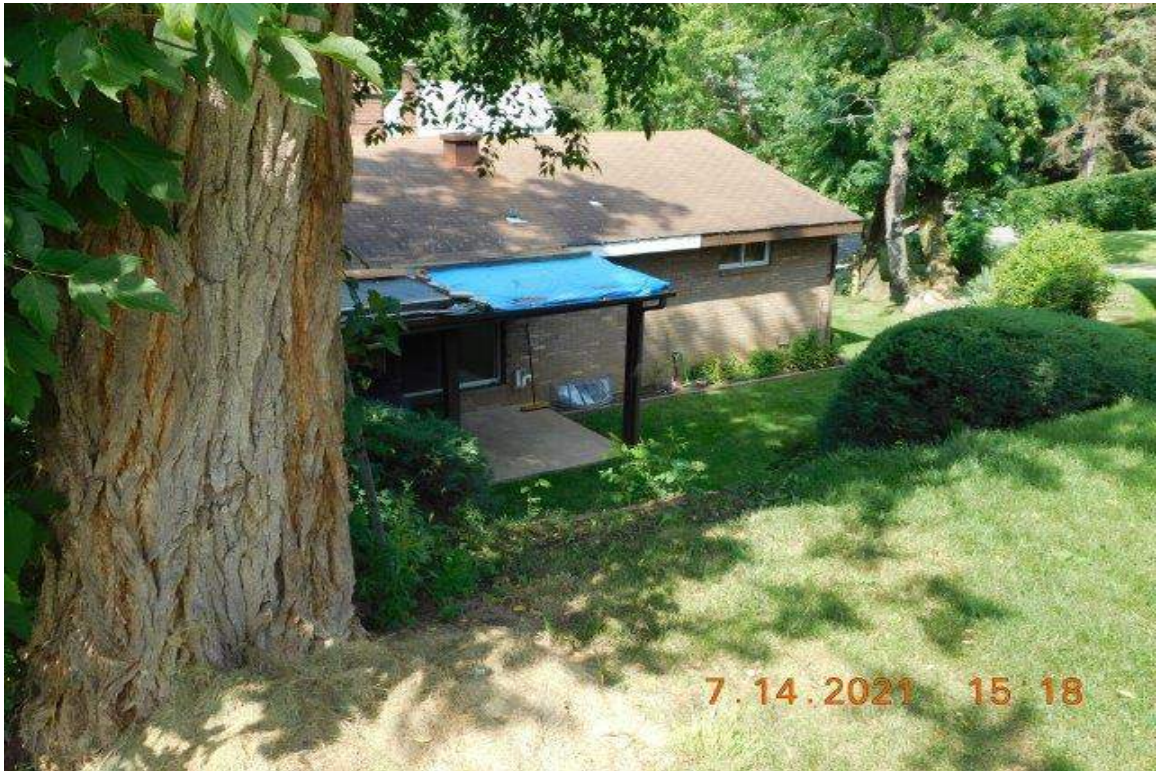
CLOSE-UP OF AREA ON PHOTO 4
